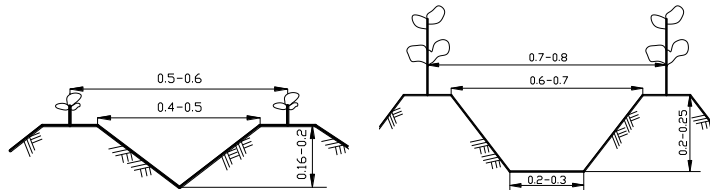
Certain ditch sections (unit: m) (a) triangle; (b) trapezoid
